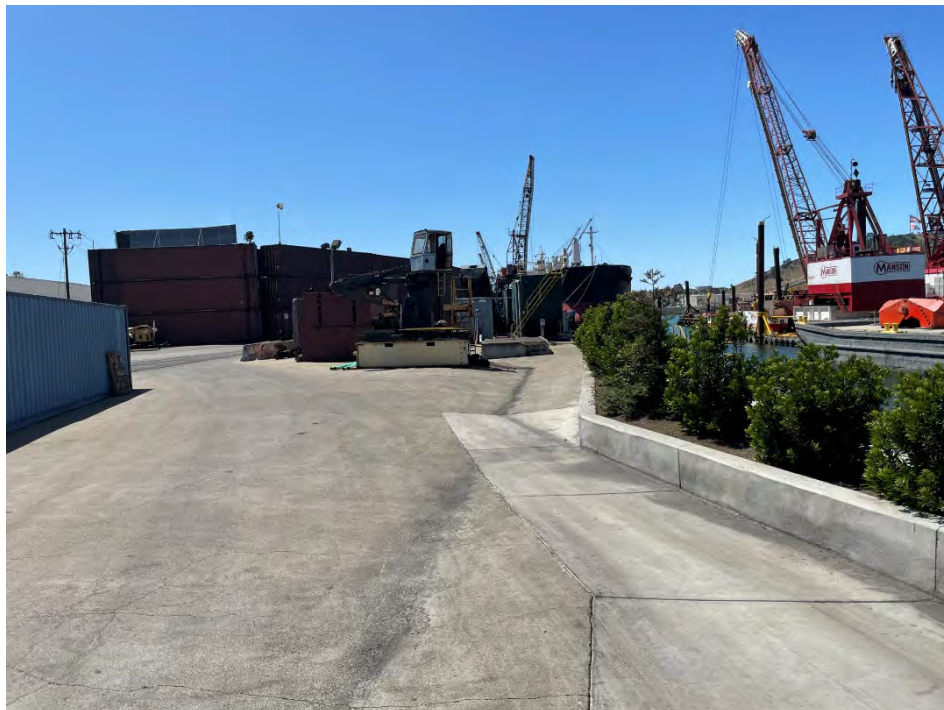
Looking south toward TS-2 (SW-5 area), no significant cracks or deterioration noted in the area.
